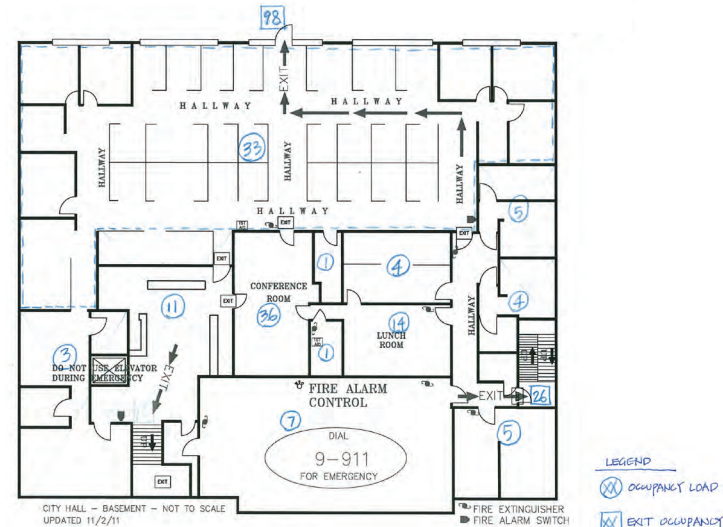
D Basement Floor Occupancy Load and Exit Diagram
